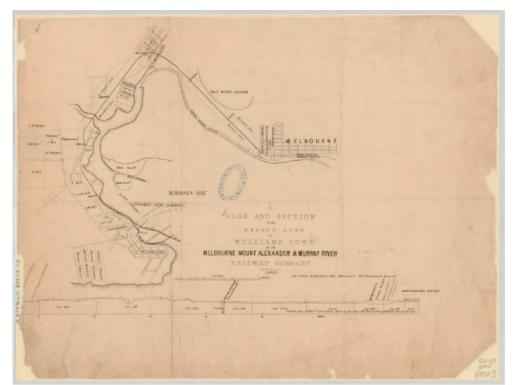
Plan of the branch line to Williams Town for the *Melbourne Mount Alexander* & Murray River Railway Company, c1852? (Source: SLV, Record ID: 9911088023607636)
